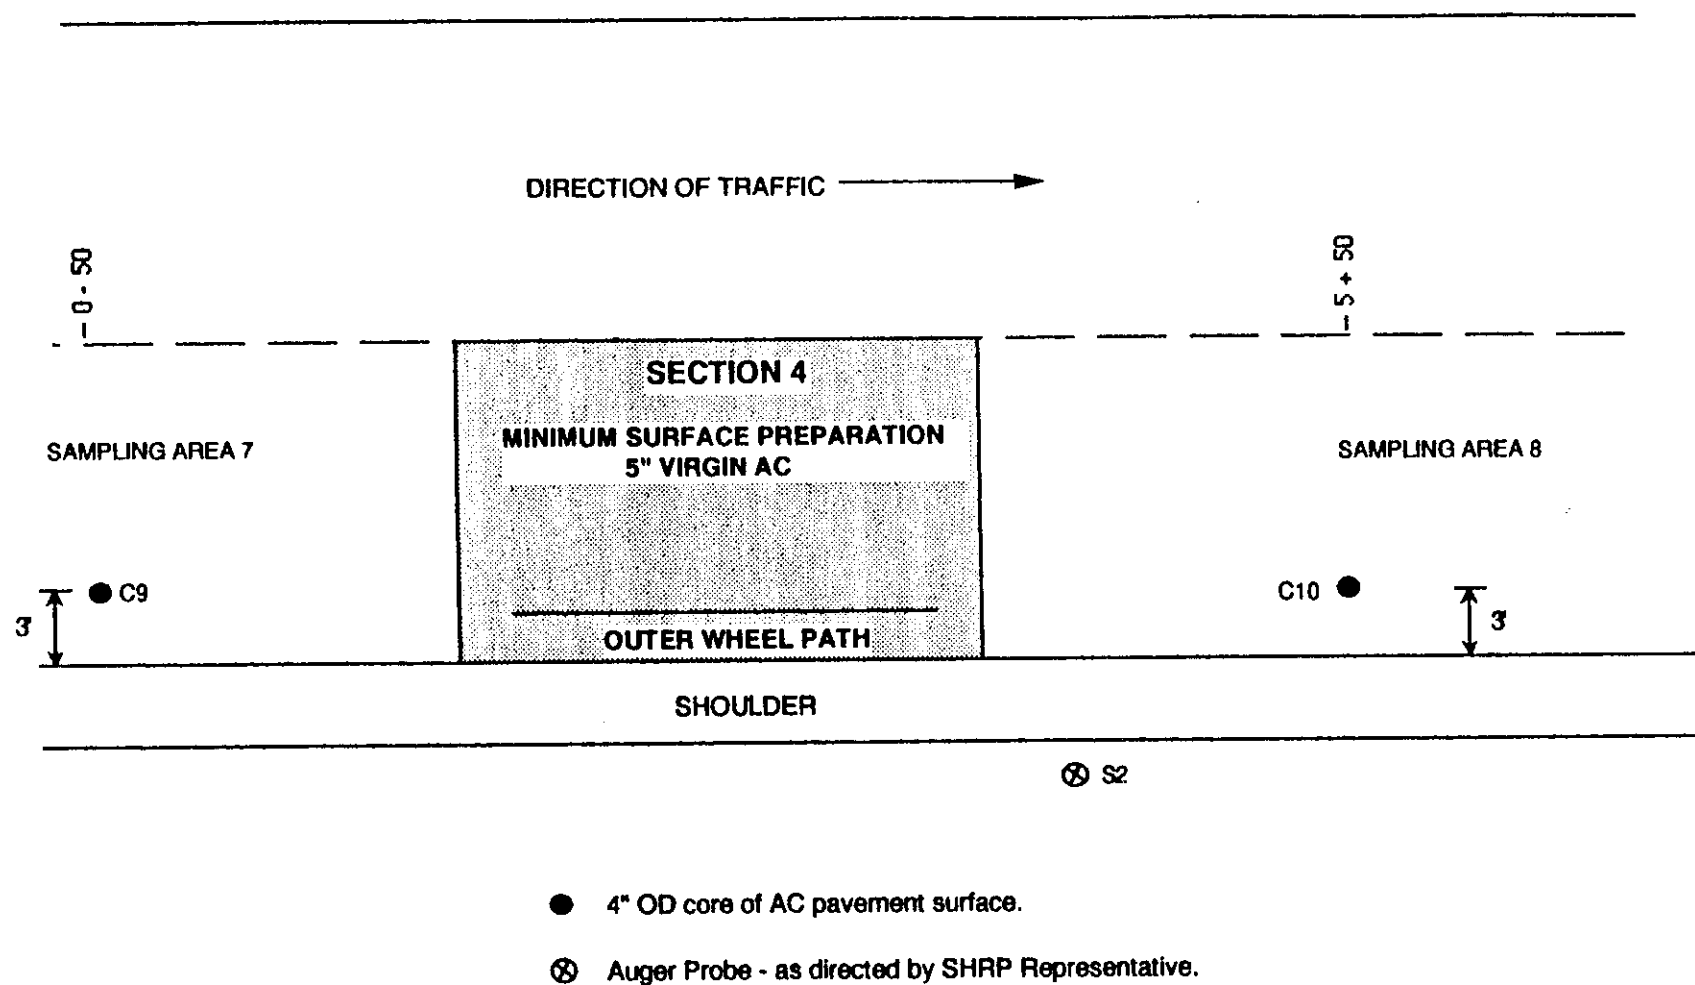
Example of "Pre-Construction" Sampling Plan for Section 4.
